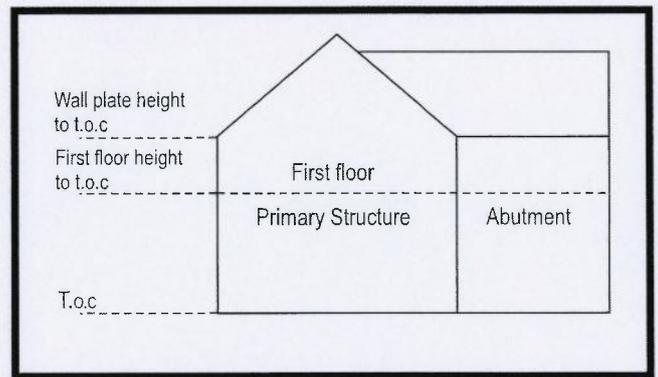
Wall plate height of a double story primary structure and abutment with pitch roofs
